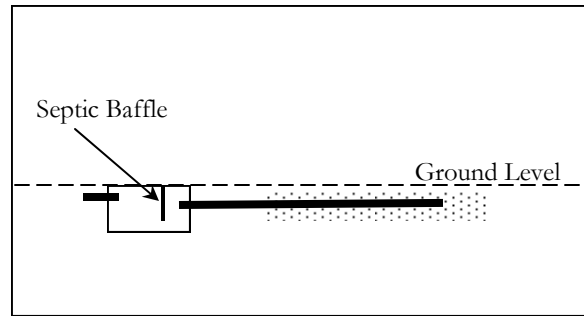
B. (Side View) Septic Tank and Precast Concrete Block-Trench System.
